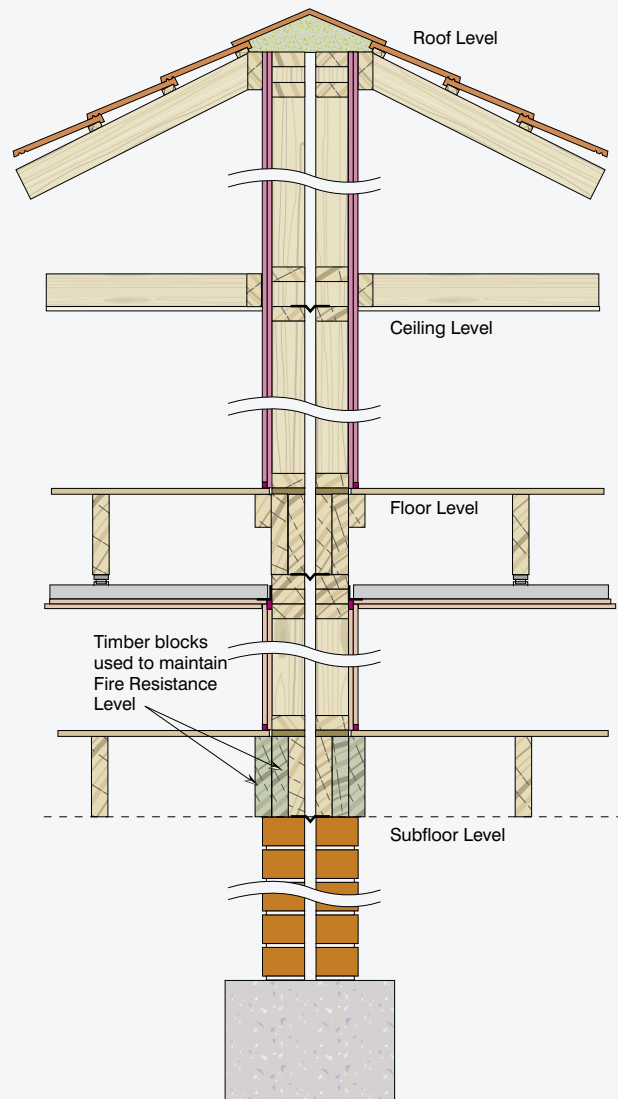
Main elements that make up a fire- and sound-rated timber-framed building – elevation view.
